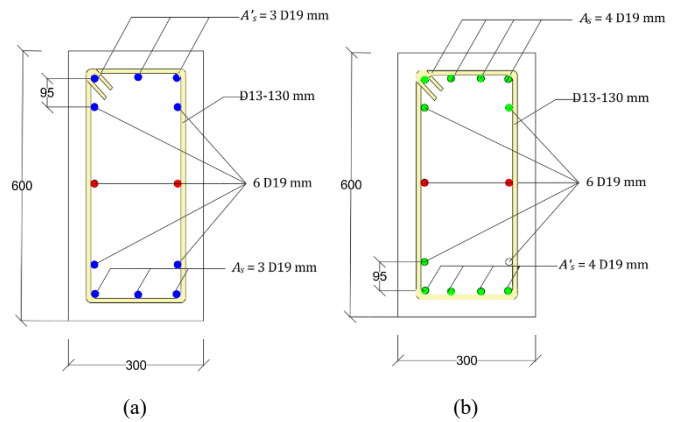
(a) Reinforcement of the Main Beam at the Span Region, (b) Reinforcement of the Main Beam at the Support Region.
